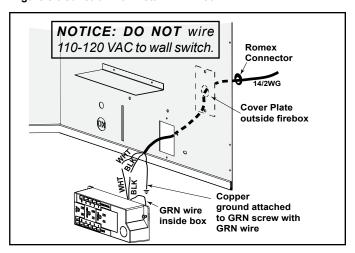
Junction Box Wiring (Generic Model Shown)
